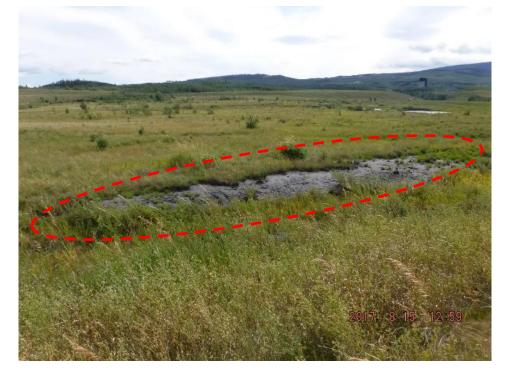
From dam crest near Sta. 0+600 looking at the ponded area and the tailings beach; no sign of sinkholes or distress (PTD-2017-38)
